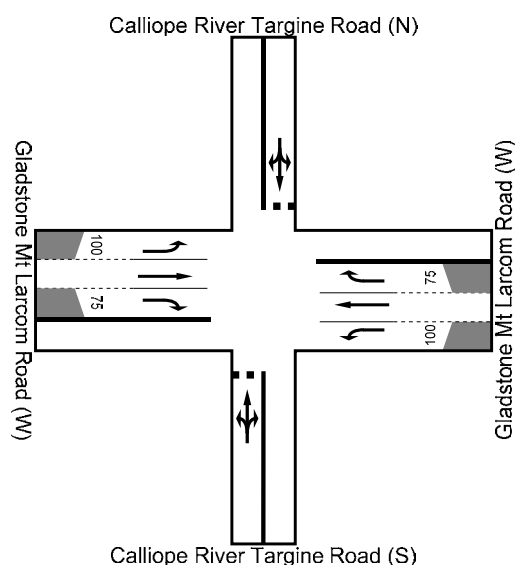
Existing Gladstone-Mt Larcom Road/Calliope River Targinie Road intersection
